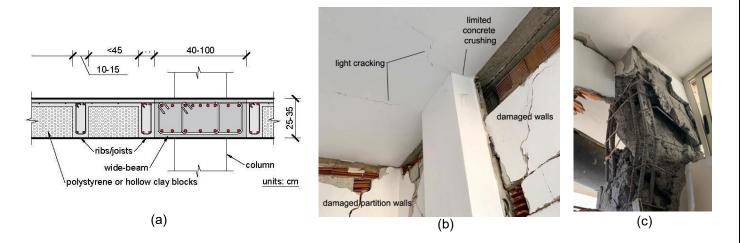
Wide beams in Albania: (a) typical detail (source: Brisid Isufi), (b) minor damage, and (c) a damaged column with poor detailing with the wide beams undamaged (photos: Markel Baballëku).
